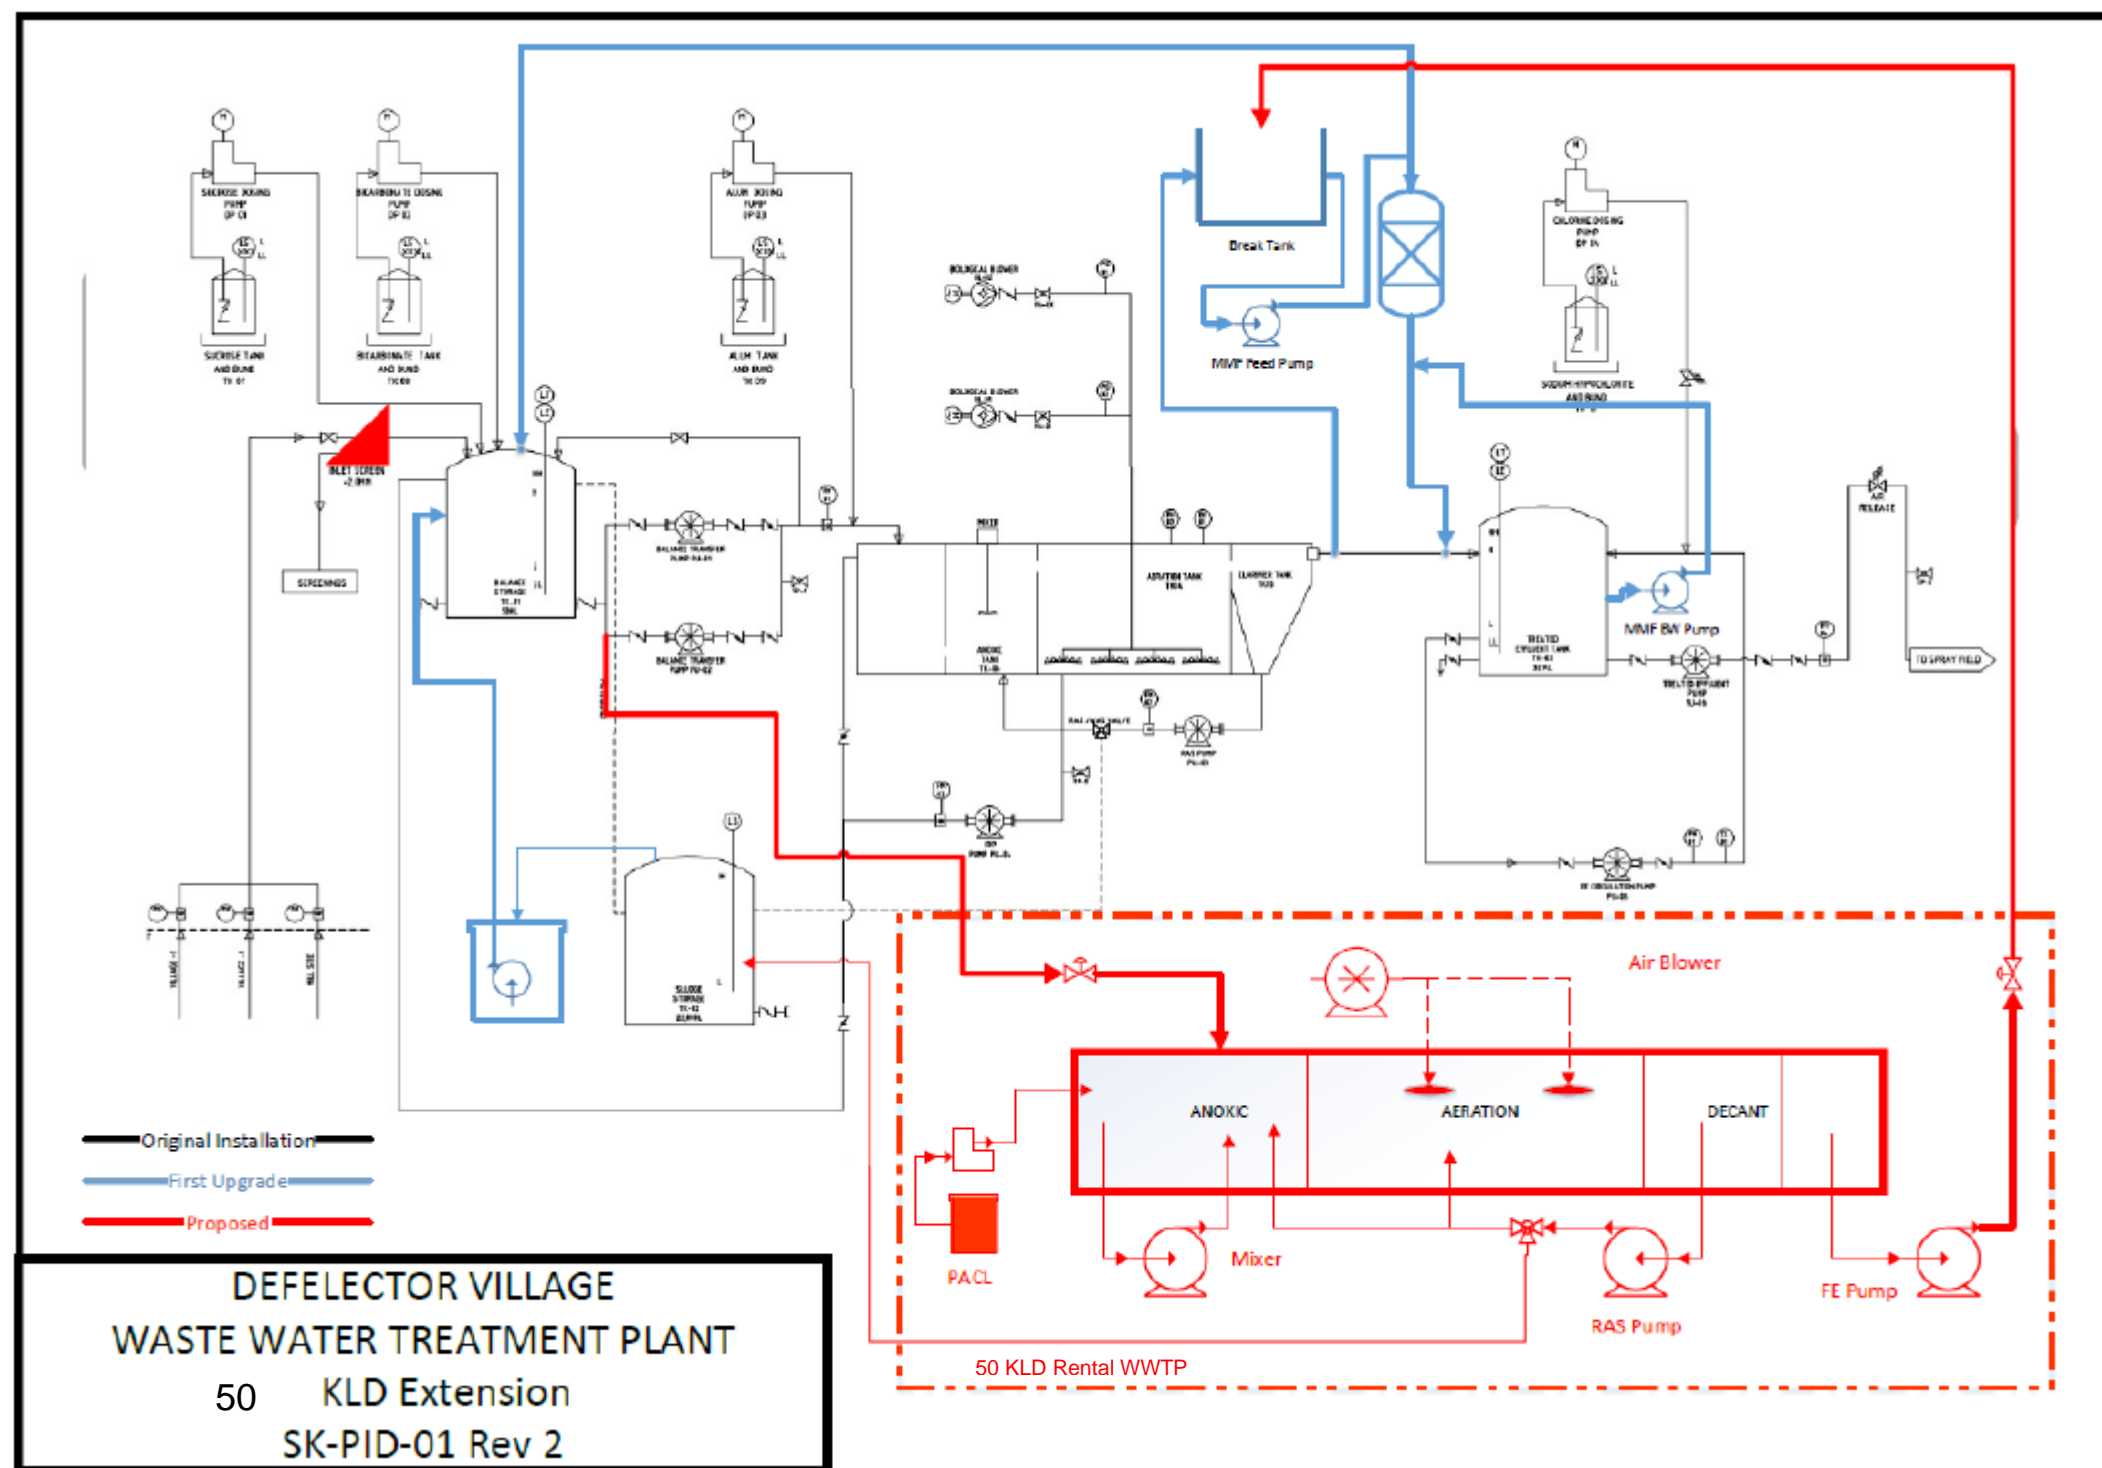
WWTP detailed site plan of 50 KLD extension showing all upgrades.
